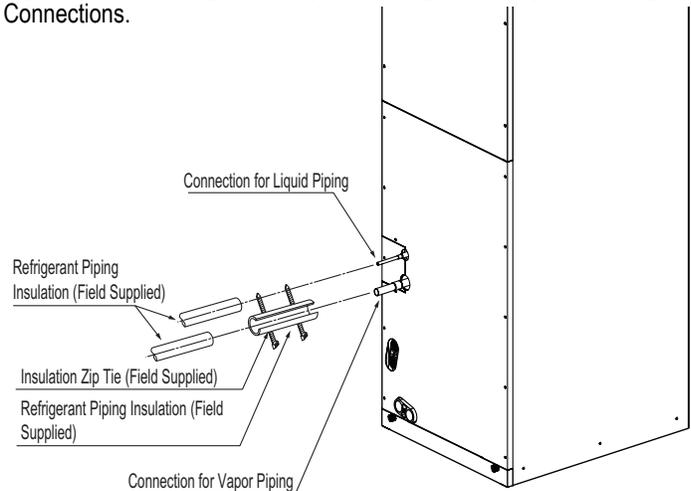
Insulating the Refrigerant Piping and Refrigerant Piping Connections.
